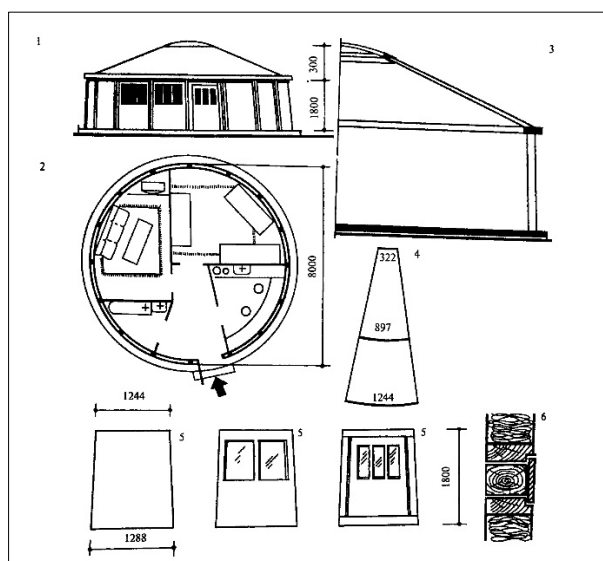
Modern portable dwelling (prefabricated wooden panels) 1-Elevation 2-Plan 3-Cross section 4-Roofing panel section 5-Wall panel section 6-Detachment of wall panel to the column [20]
